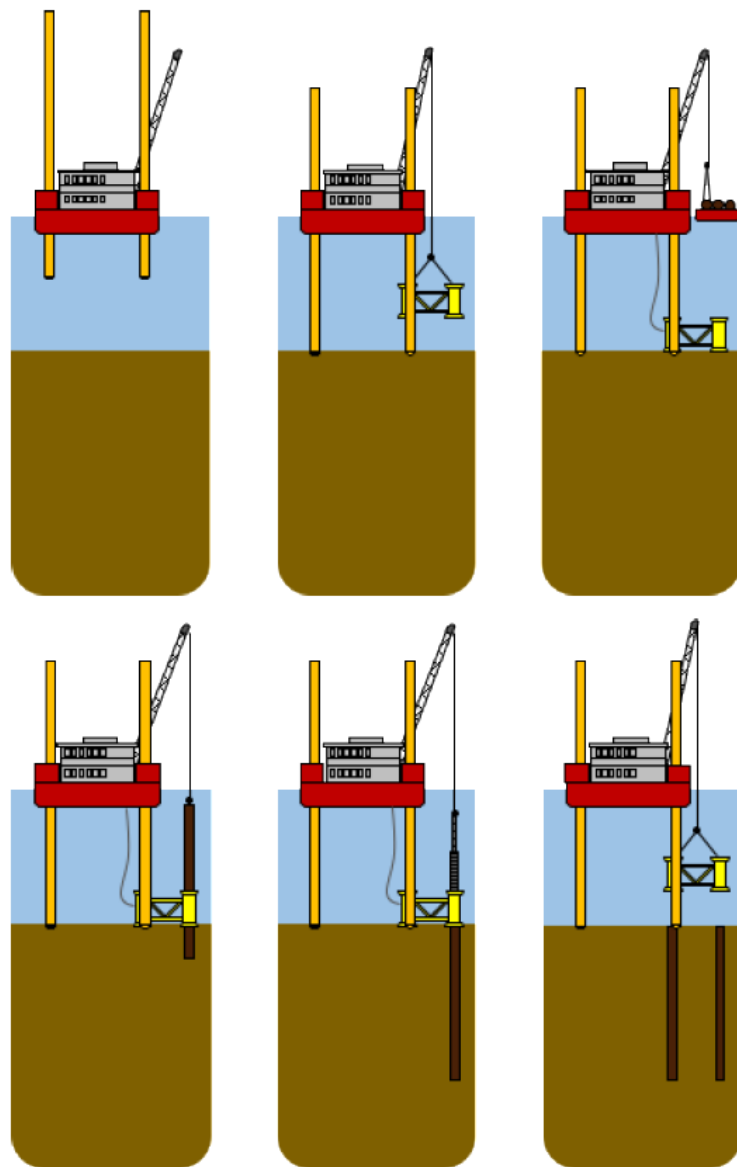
Typical Installation Sequence for Pin-Piled Foundation
